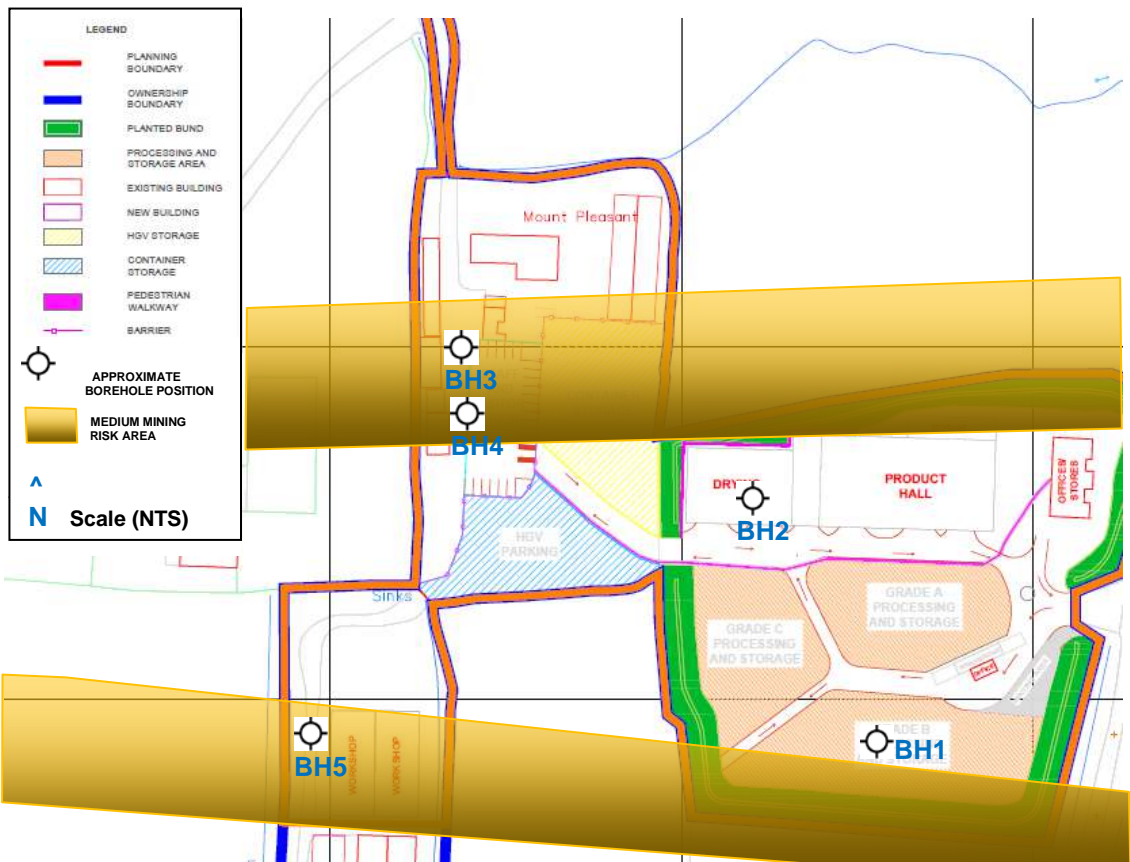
Borehole Location on Proposed Layout Plan (Not to Scale)
